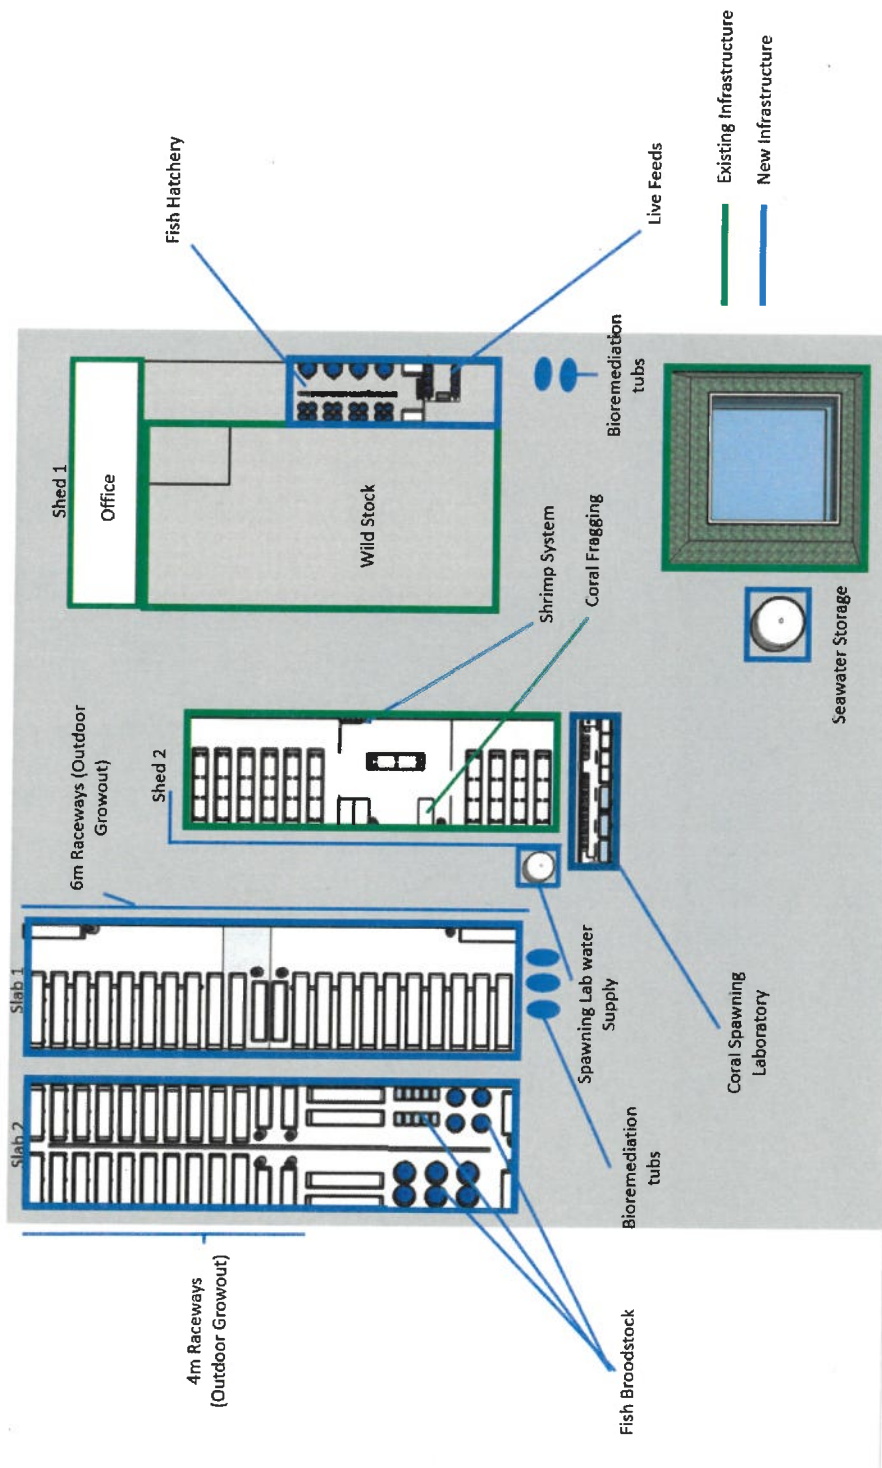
The proposed layout of 145 Buss Street property with proposed designated aquaculture areas marking existing (green) and proposed infrastructure (blue).
